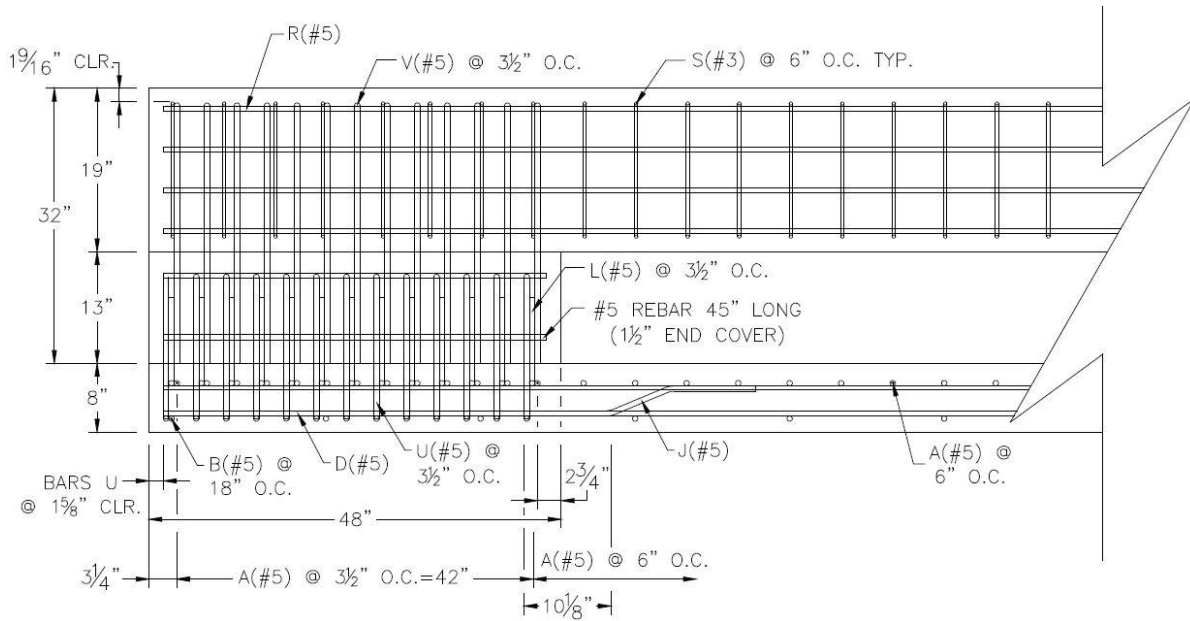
TxDOT T223 Bridge Rail Drawing [25]
